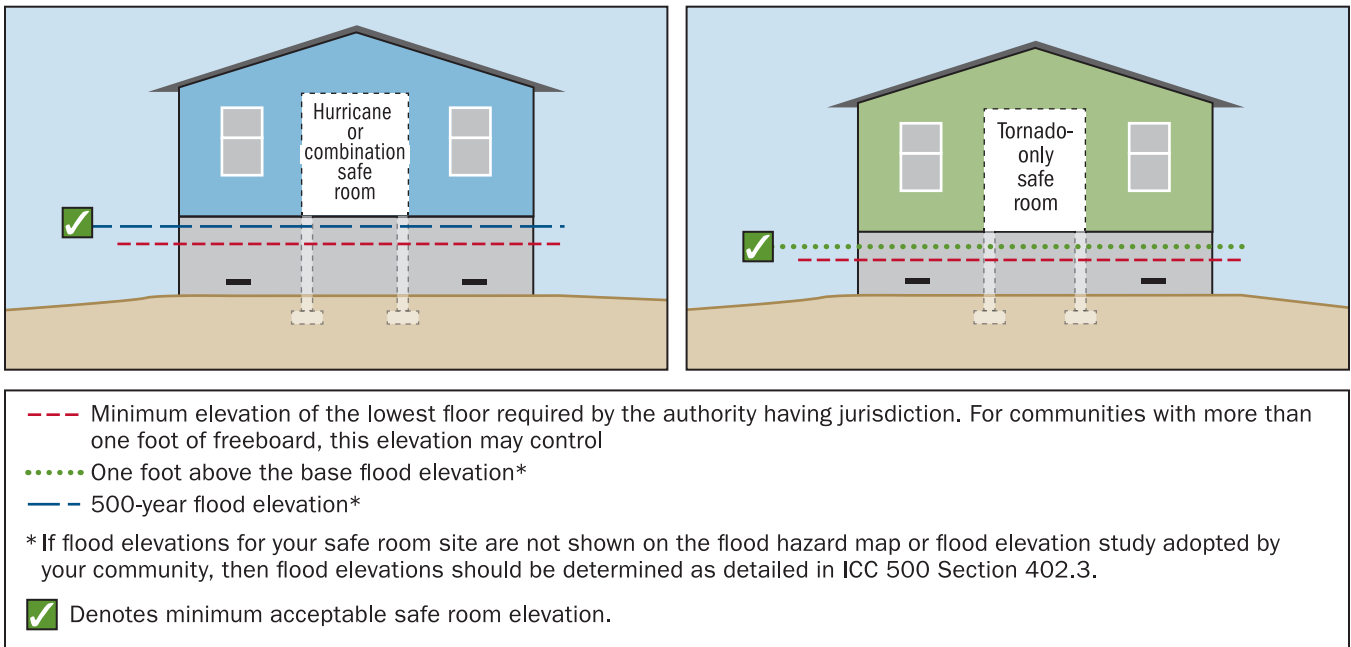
Illustration of residential safe room examples that meet flood elevation criteria (assuming siting requirements are met)
